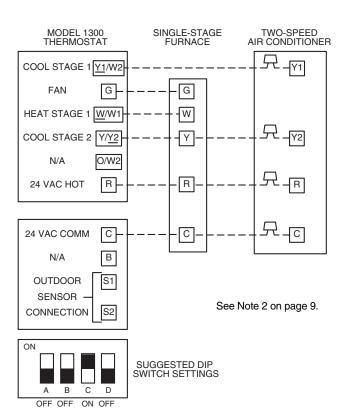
Two-Speed Air Conditioner with Single-Stage Furnace — Model 1300 Thermostat
